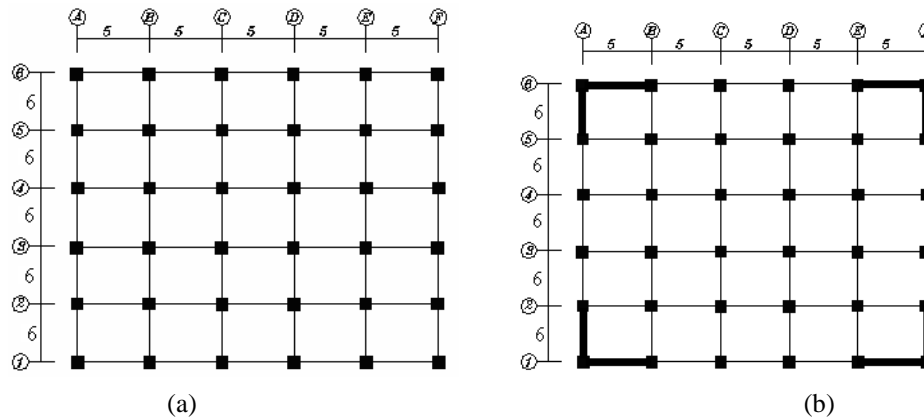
Structural configuration of (a) 3, 6 and 10 story; and (b) 14, 16 and 19 story buildings (units: meter)
